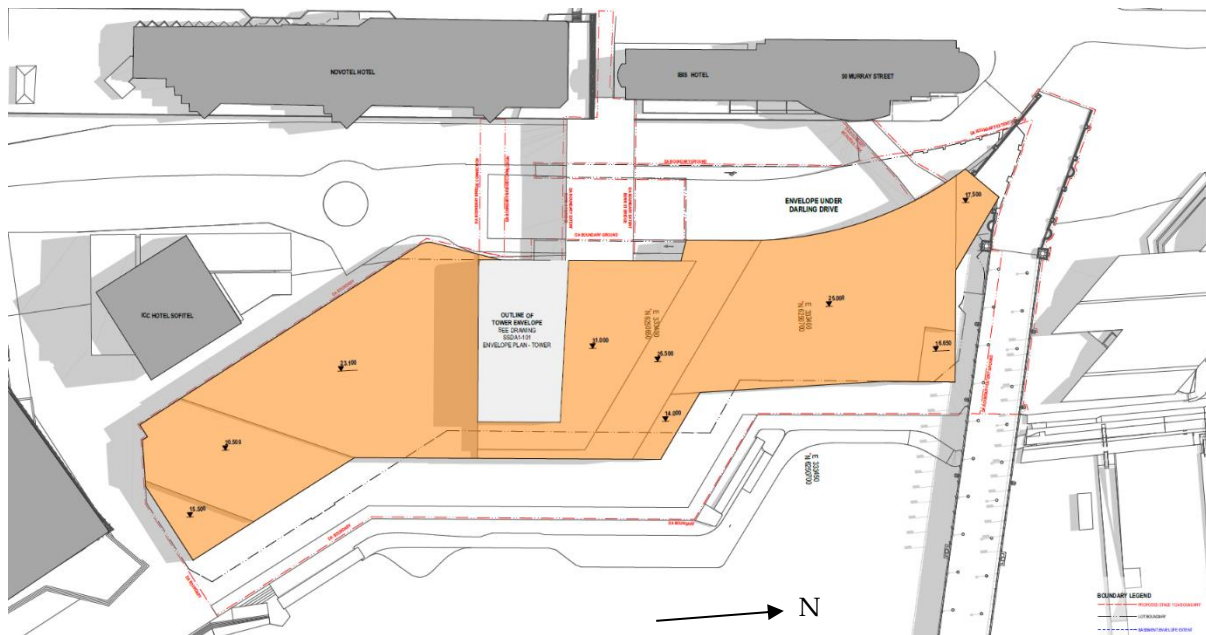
Ground floor plan for the proposed Harbourside Shopping Centre development
